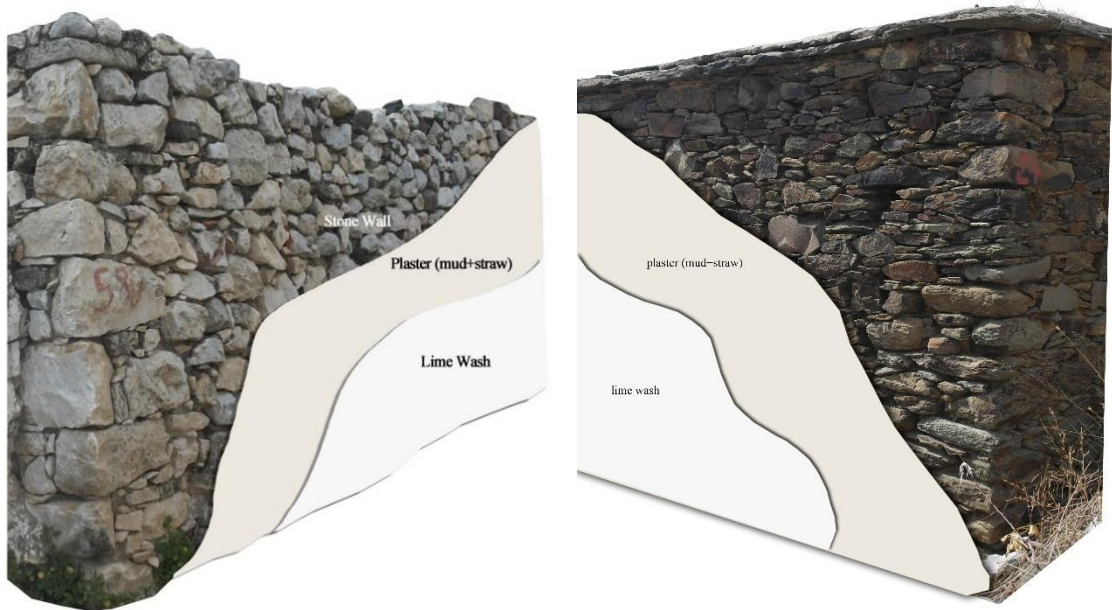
Layers of stone wall coverings in Kösedere and Küçükbahçe.
